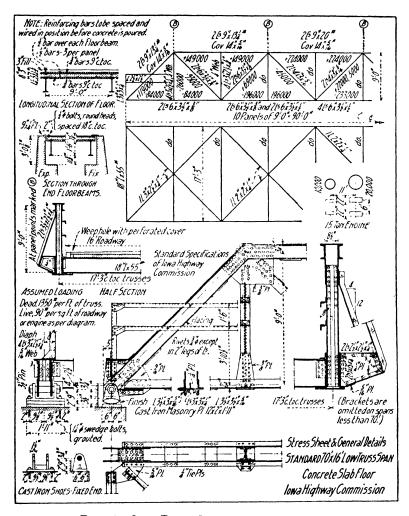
LOW TRUSS SPAN WITHOUT STRINGERS.
